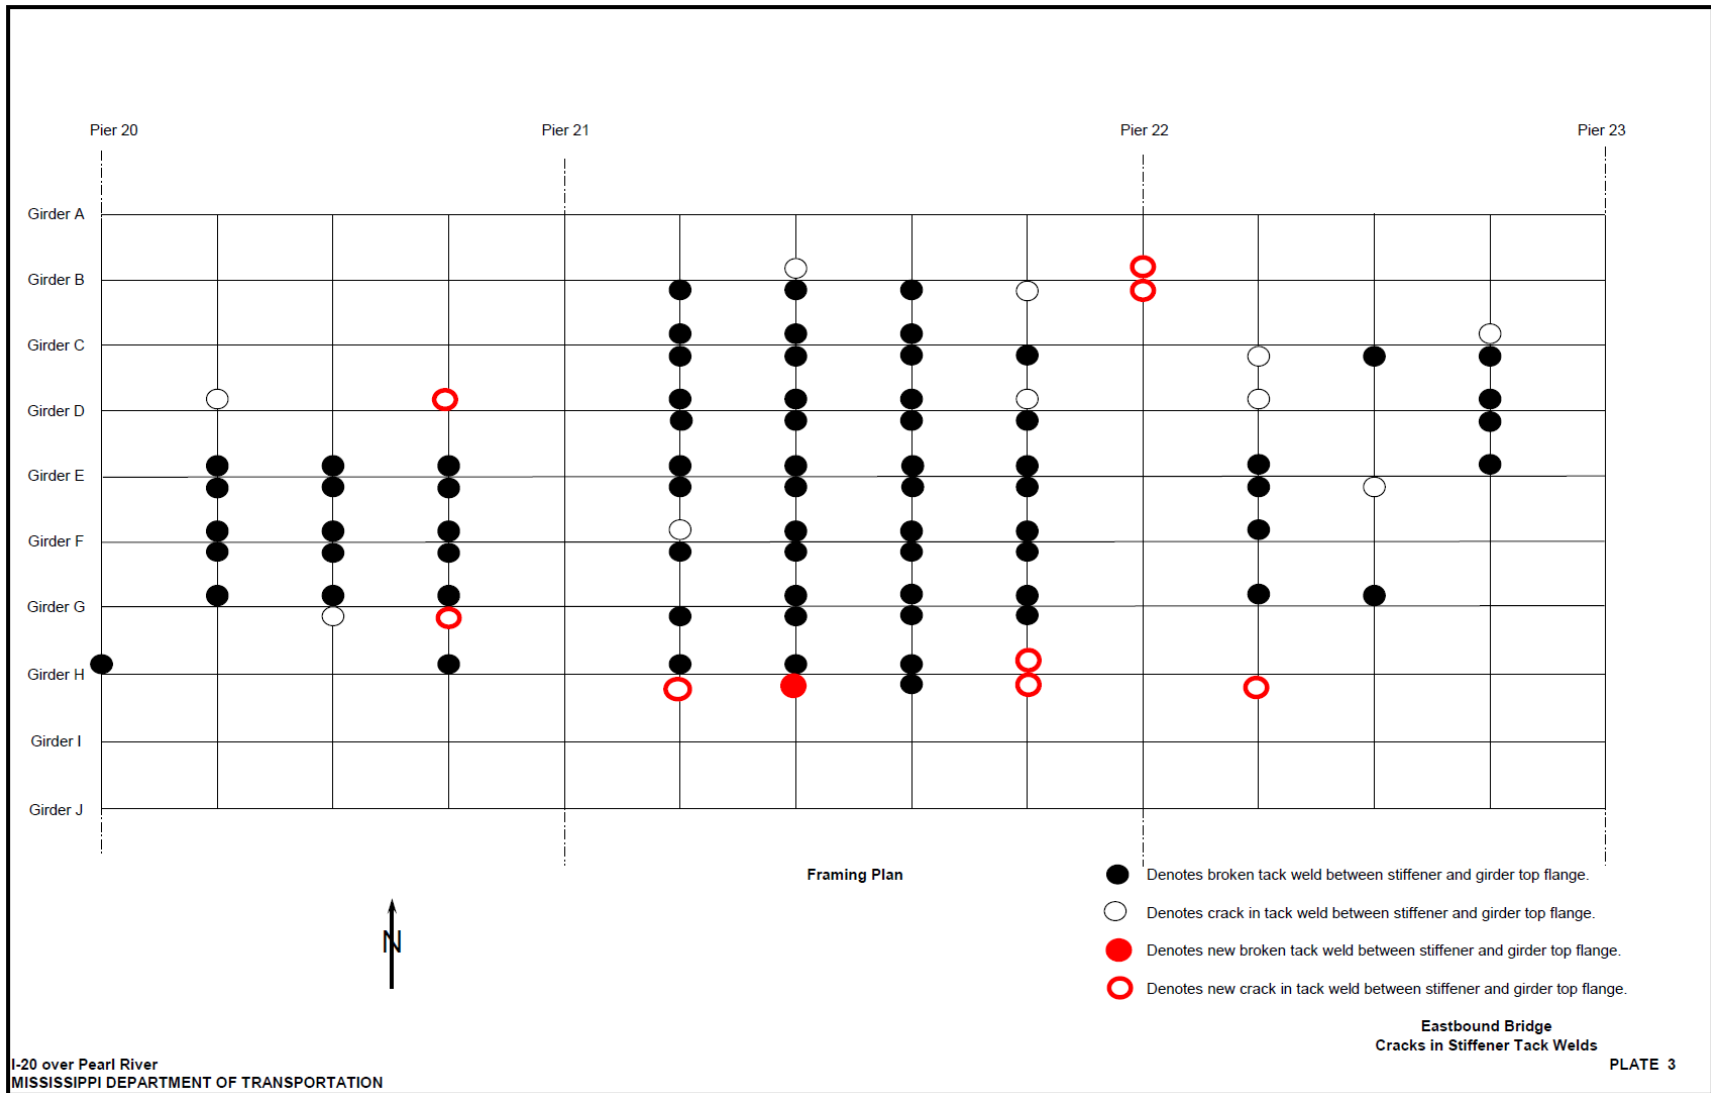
Eastbound Bridge Cracks in Stiffener Tack Welds
